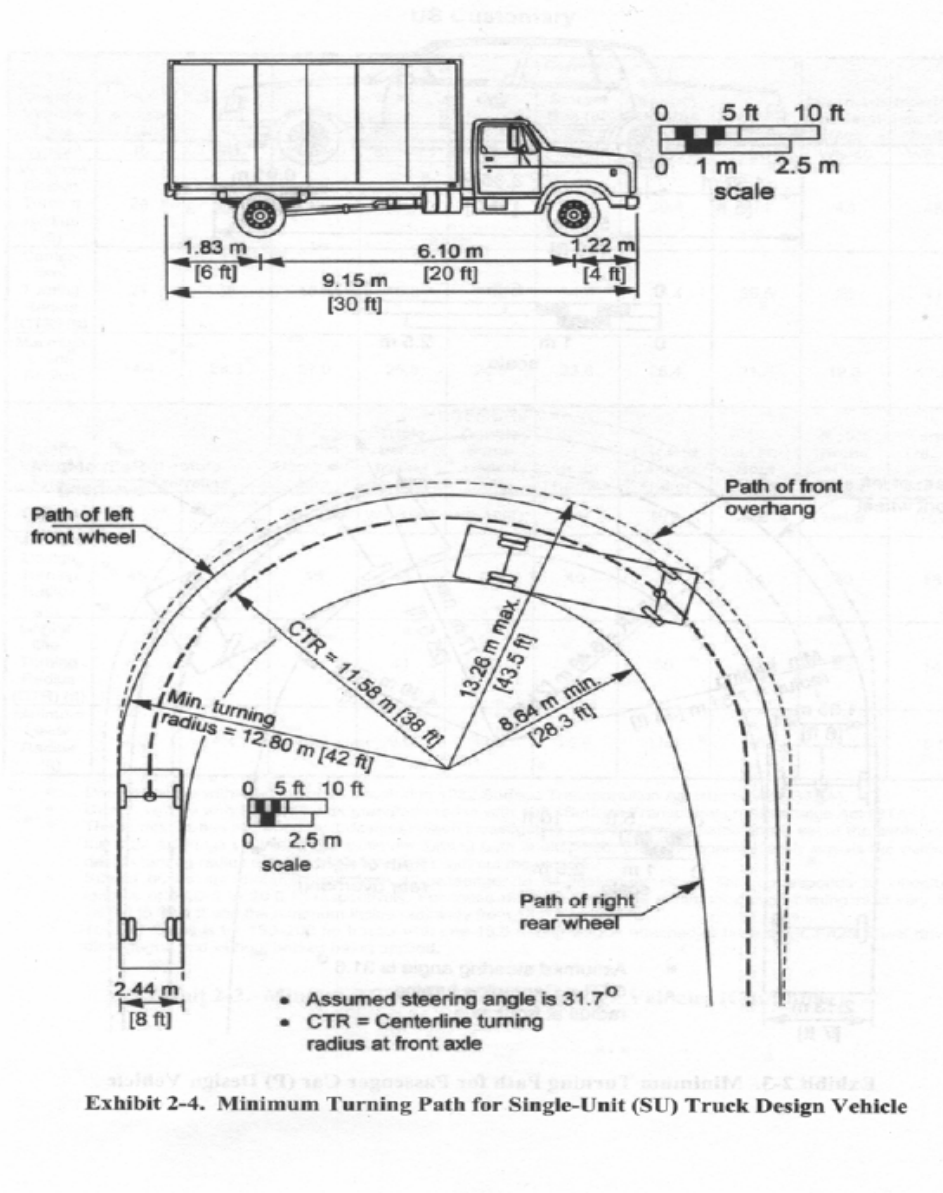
Minimum Turning Path for Single-Unit (SU) Truck Design Vehicle
